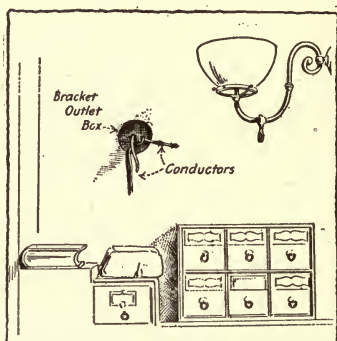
Bracket outlet box in position in owner's bedroom.
